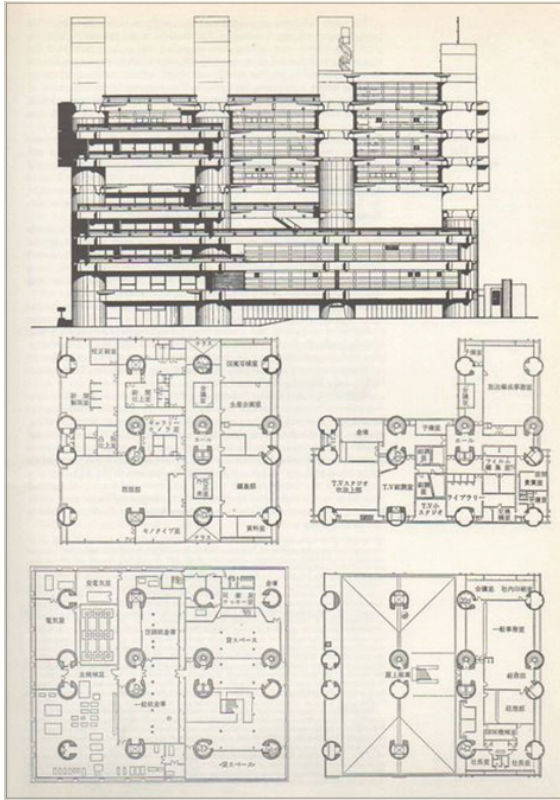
Plan view & elevation drawings of Yamanashi Press and Broadcaster Centre
